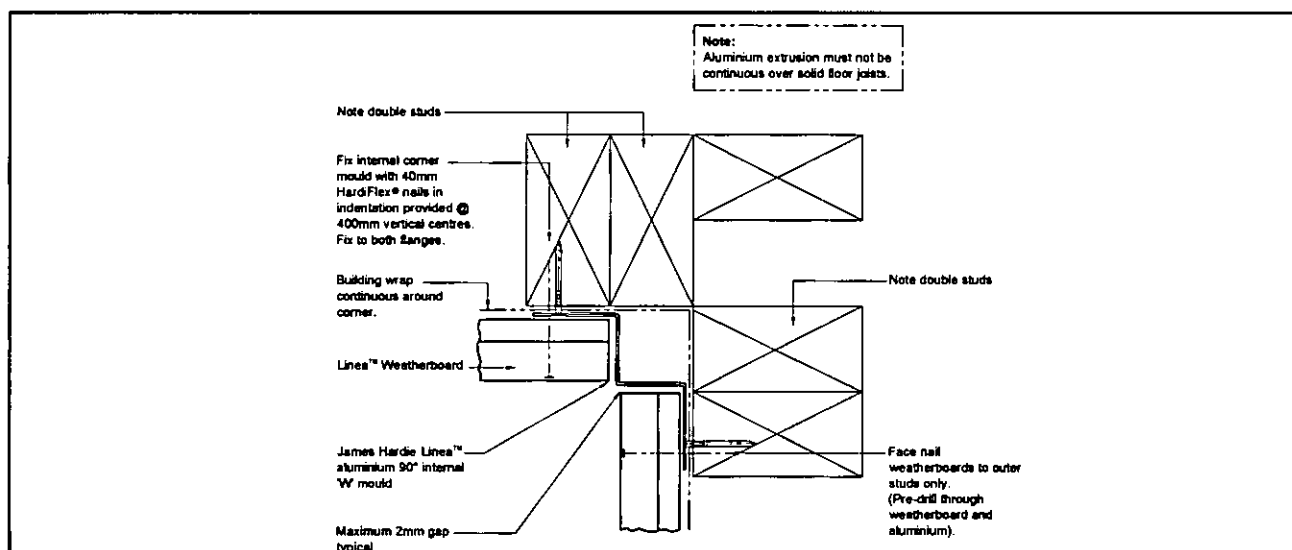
DIRECT FIX INTERNAL 90° ALUMINIUM 'W' MOULD CORNER
